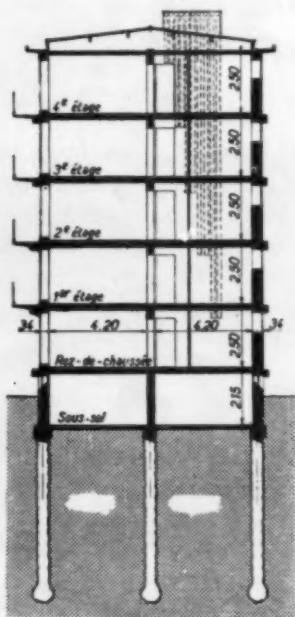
Section through 5-story Building with Load-bearing Walls.
